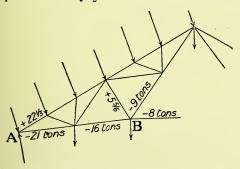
Outline of Wrought-Iron Truss for Open Roof.
